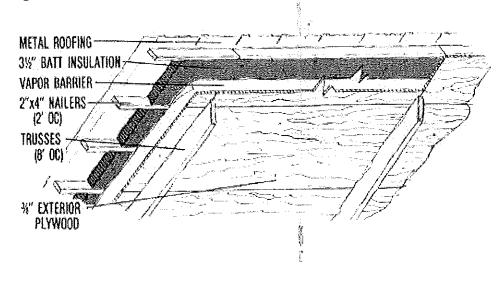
Insulated roof panels over trusses (R=13-15). Insulated root panels over trusses are best fabricated on the ground and lifted into place. Roofing is then applied. This installation is recommended for modified open-front livestock housing.
